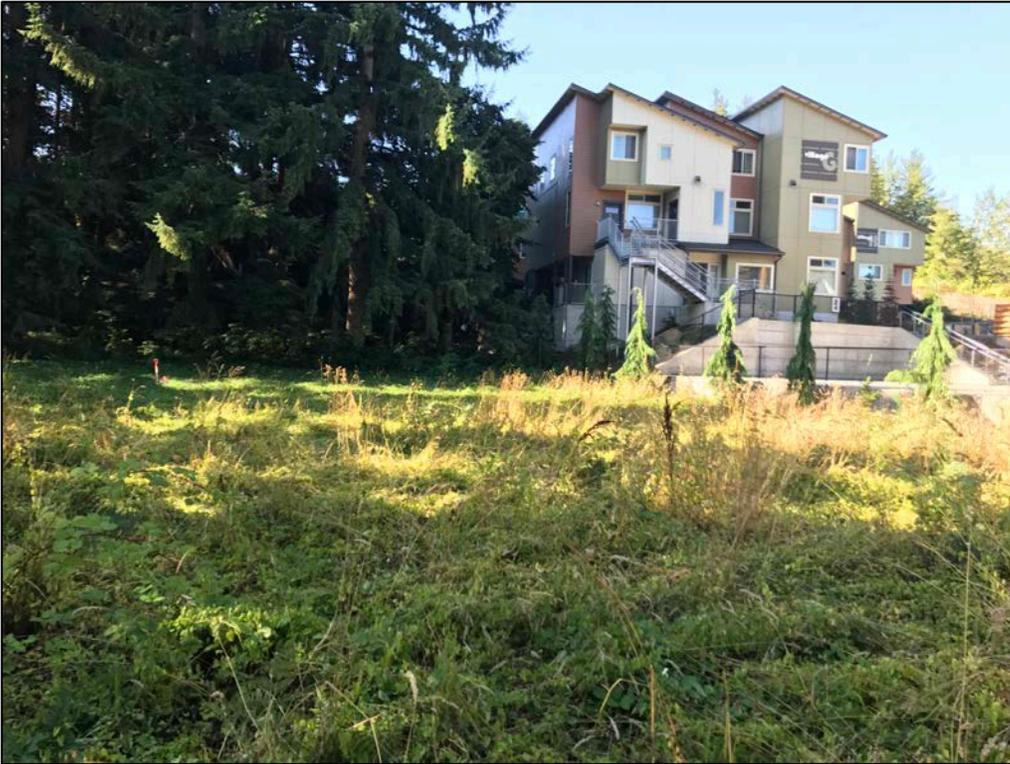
View looking west towards newly constructed townhomes on the adjacent parcel.
